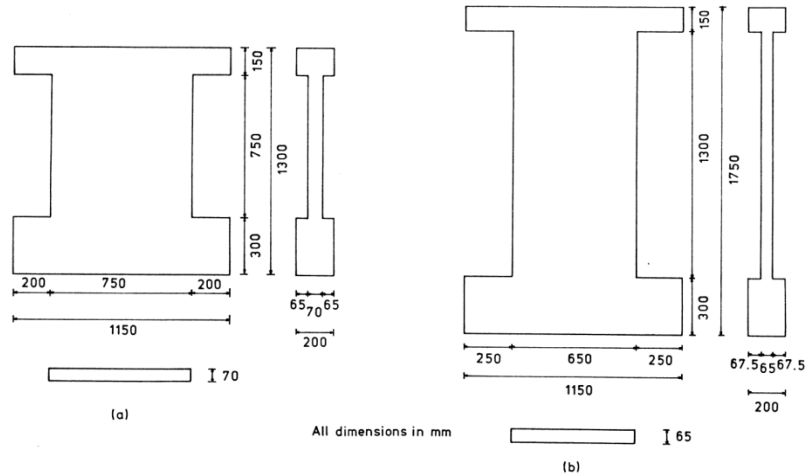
STRUCTURAL SHEAR WALL SPECIMENS (A) TYPE I AND (B) TYPE II^[206].
